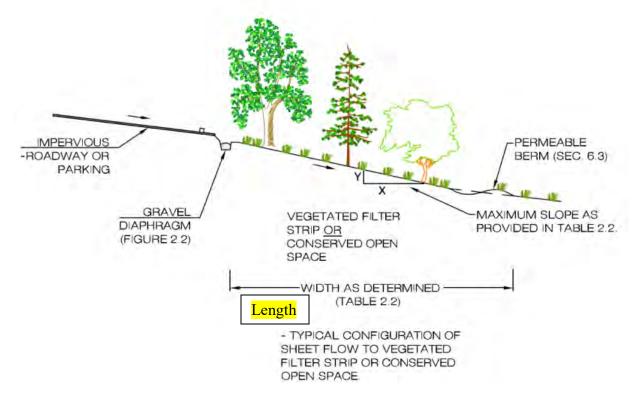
Typical Configuration of Sheet Flow to Filter Strip or Conserved Open Space
